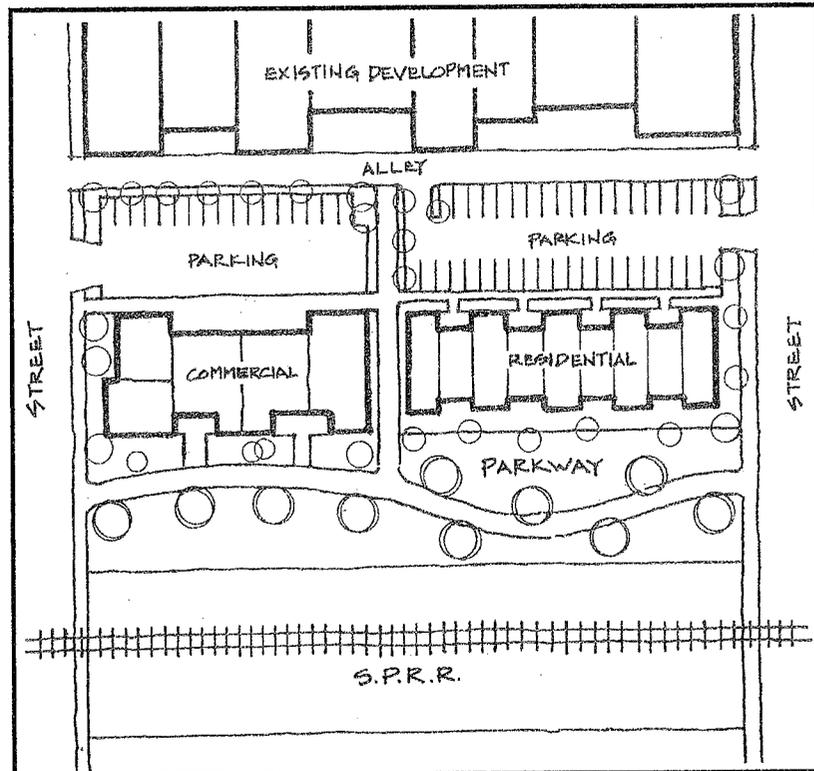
Preferred Site Plan design. Buildings front onto the parkway while parking is situated between the building and the alley.
